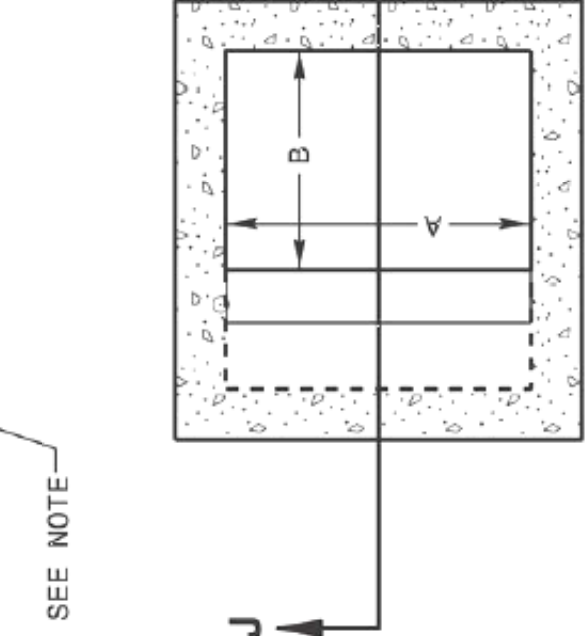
DETAIL SHOWING METHOD OF RISER CONSTRUCTION
